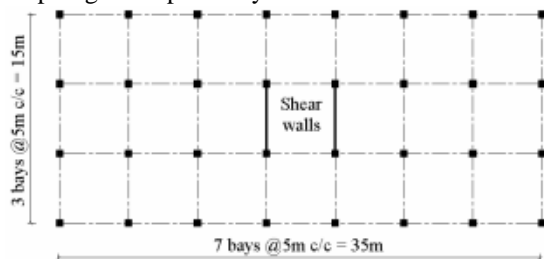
Typical floor plan for 6 and 12 storied buildings
